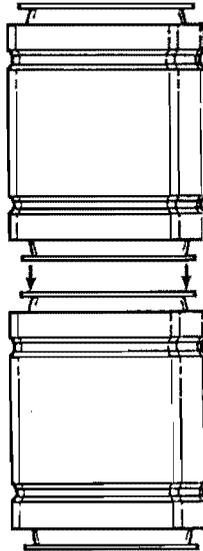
Basic Assembly Step 1: Butt adjoining inner wall flanges together.
